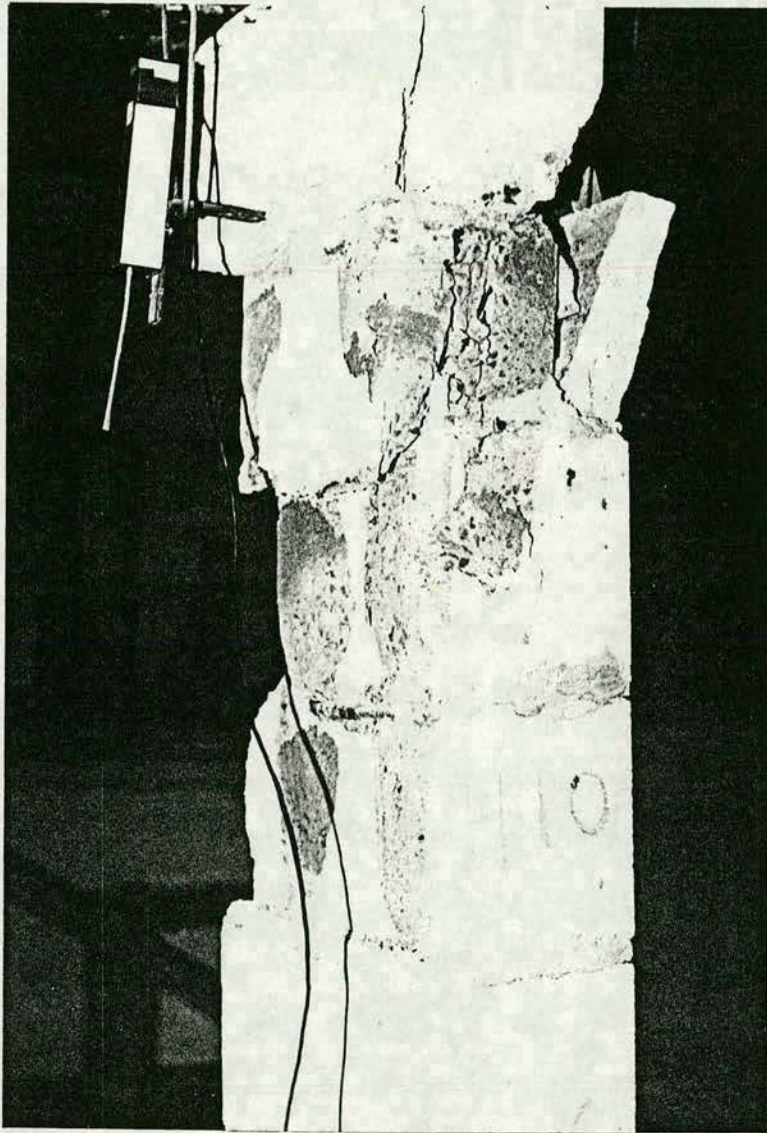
Mode of failure of full-block masonry column reinforced with 10 mm ϕ lateral ties.
